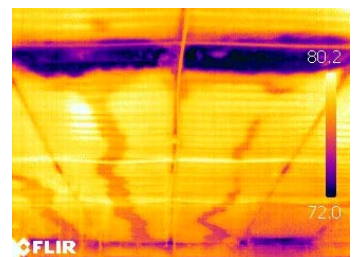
Roof leaks have damaged insulation in the dark areas near the center of this building and also in the dark trails where water has run on top of the ceiling down toward the eave.
